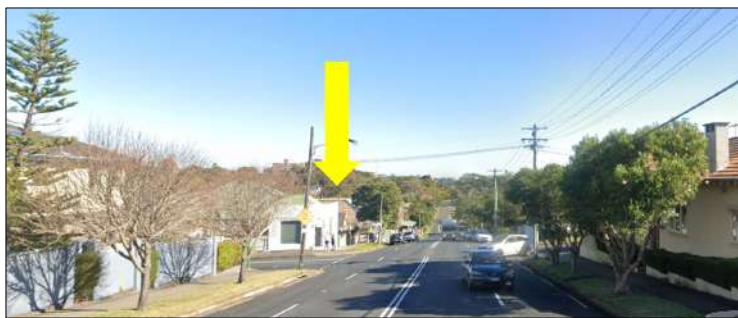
Looking west towards the subject site (indicated by the yellow arrow) on Ourimbah Road.
